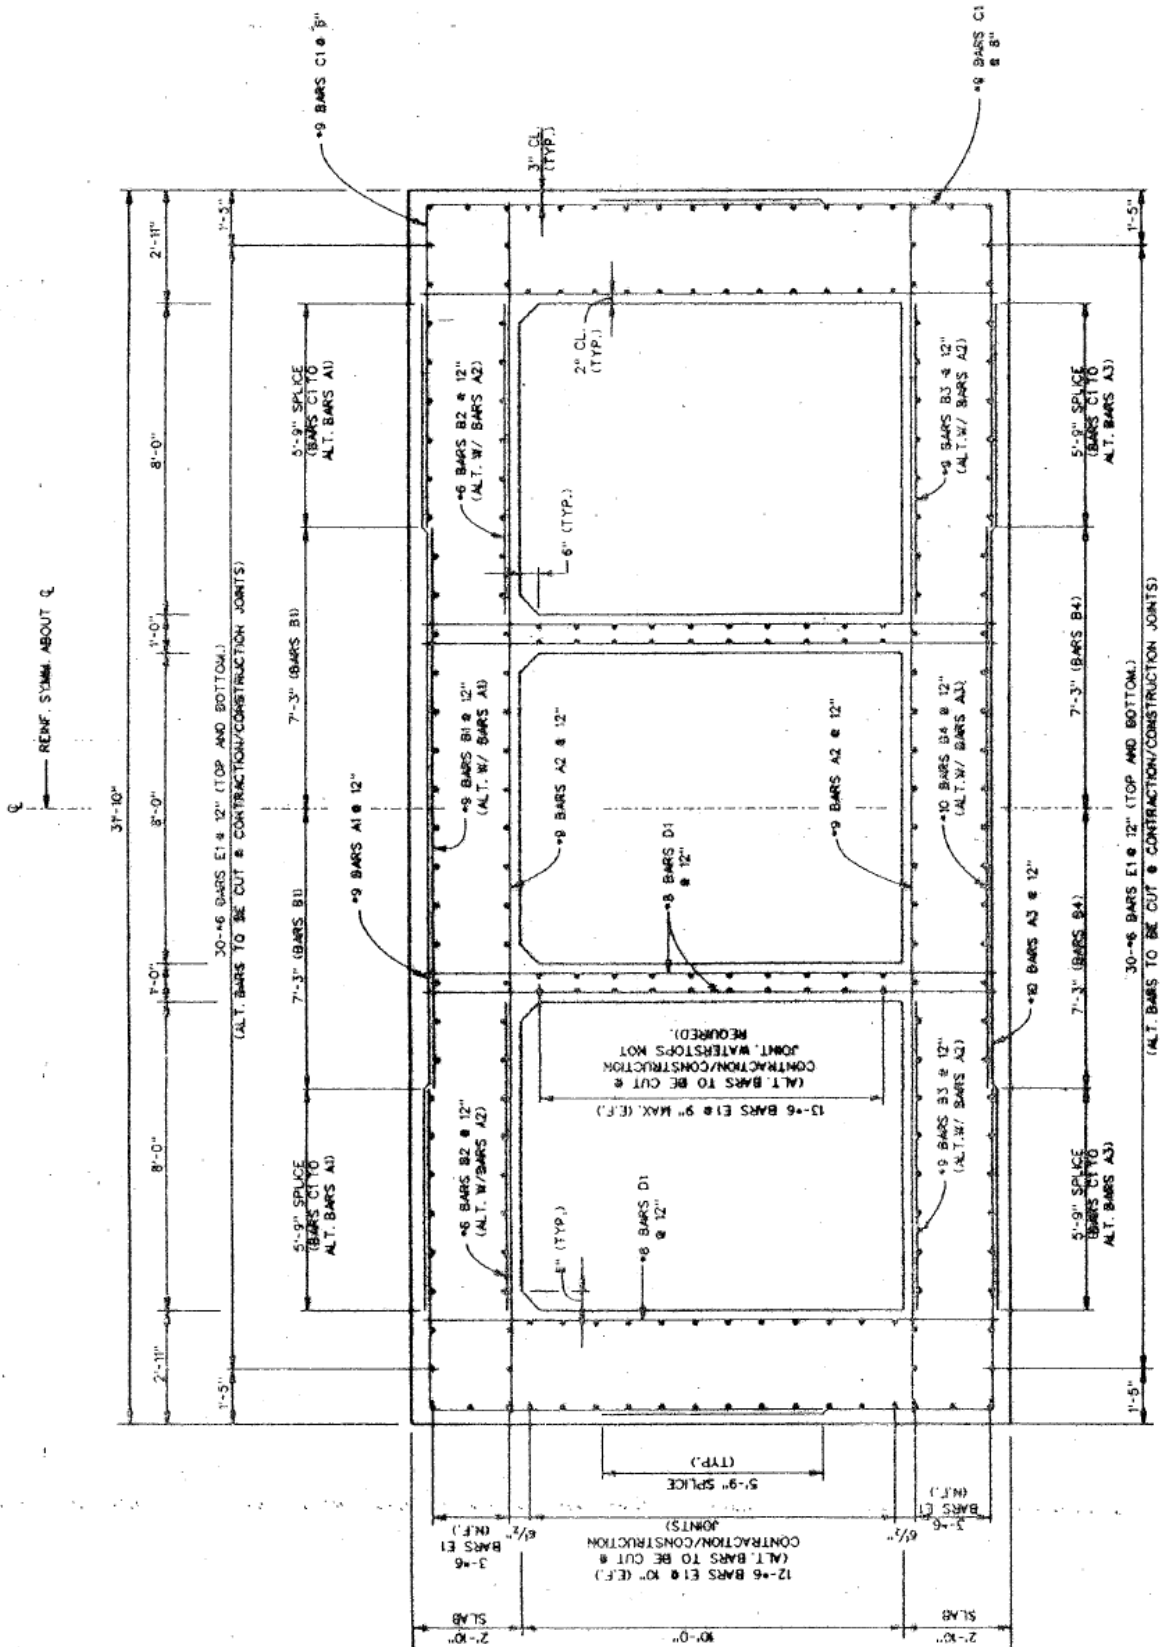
Corridor X Culvert at 4877+13 Cross Section (ALDOT 2000a)
